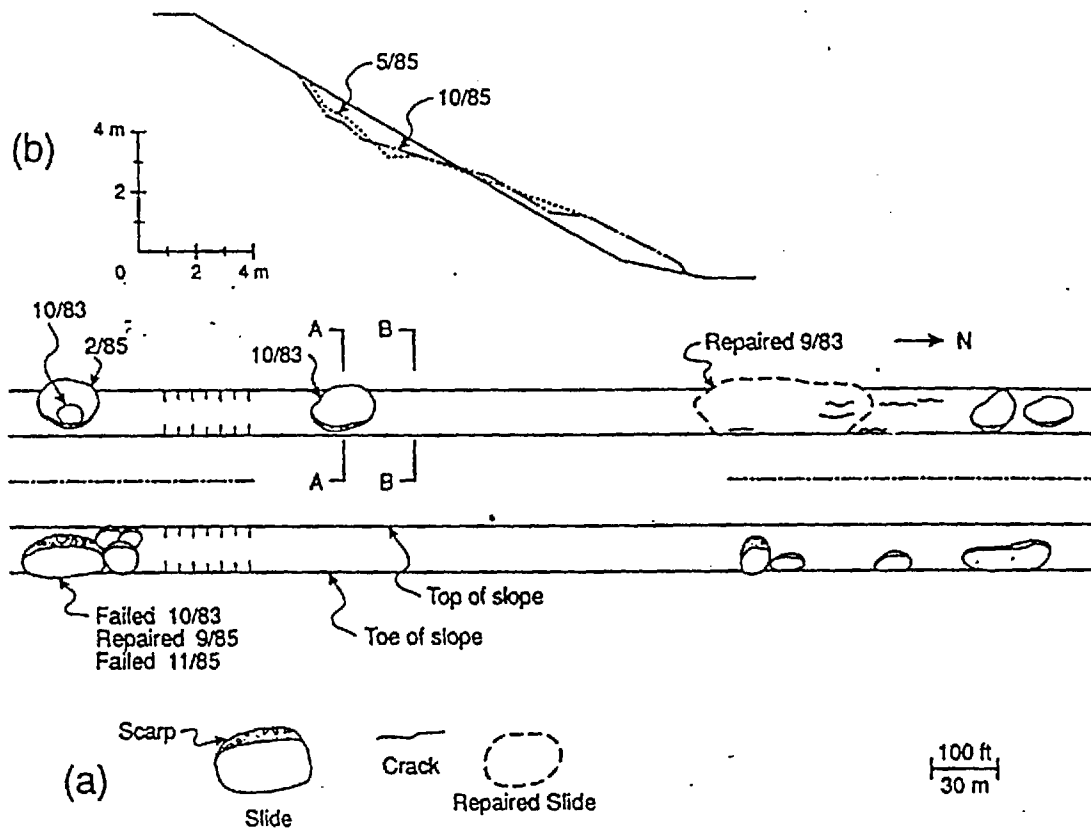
Embankment failure, I-77, Ohio: (a) plan, (b) section A-A (Wu *et al.* 1993)
